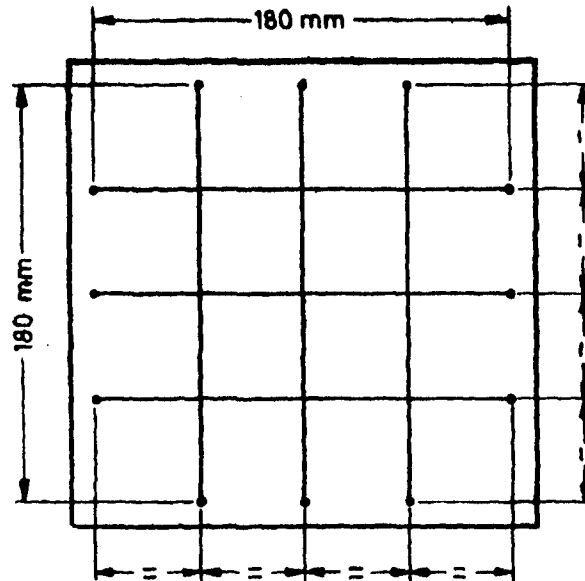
REFERENCE MARKS ON TEST SPECIMEN
